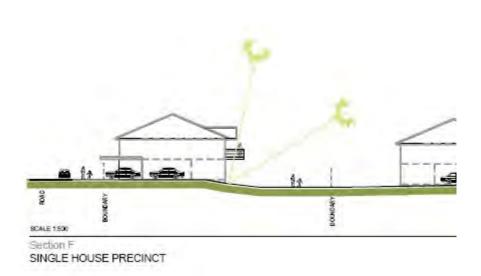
Cross sections in the Single House precinct showing the space and access to natural light (H+H Architects)
